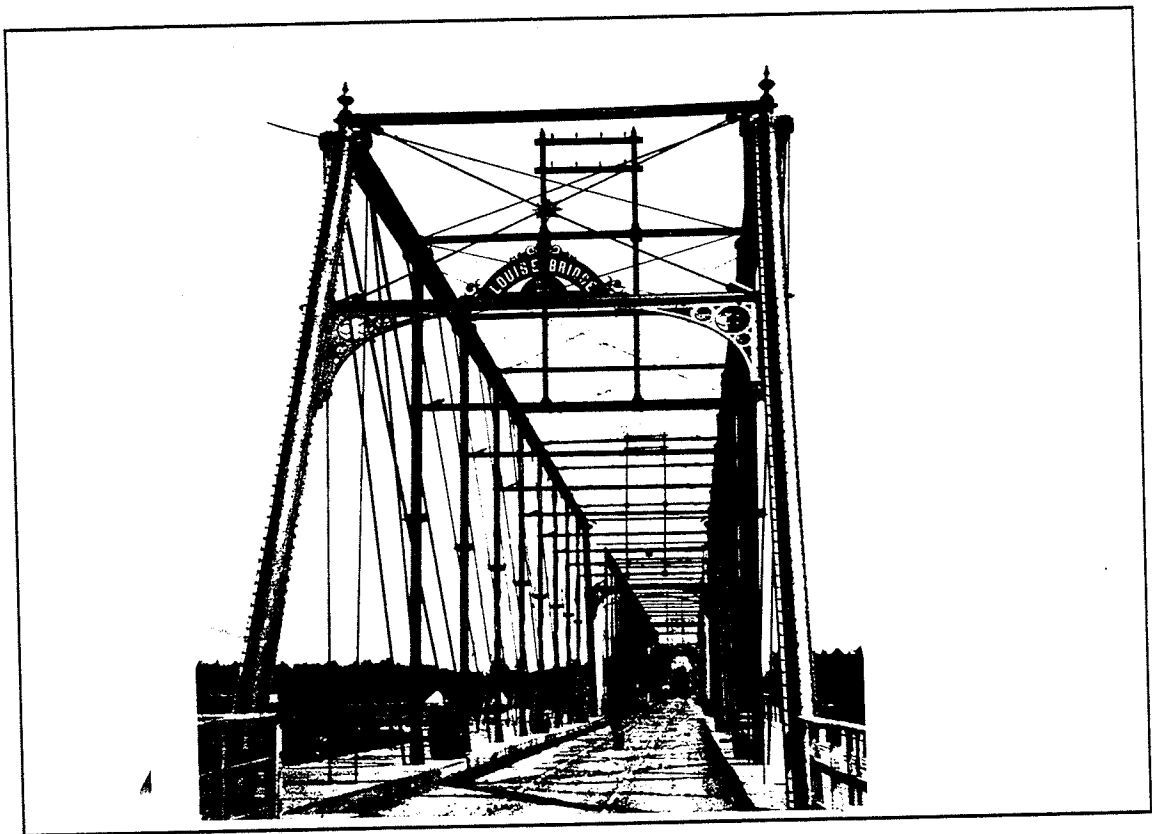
THE LOUISE BRIDGE: Winnipeg's first railway bridge
